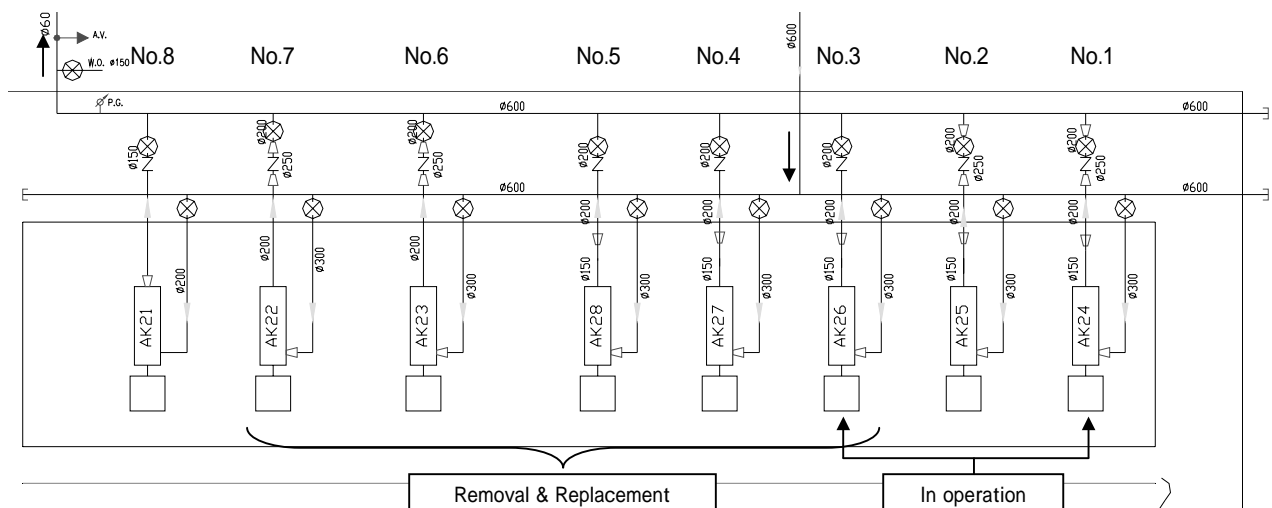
New Layout Plan of Azraq Pumping Station
